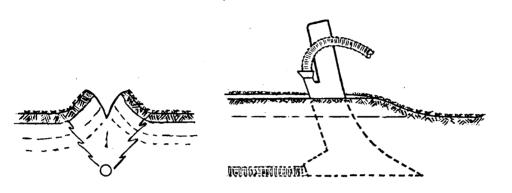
"Trenchless" installation of subsurface drains. Lifting action disrupts and shatters soil at an angle outward and upward.
